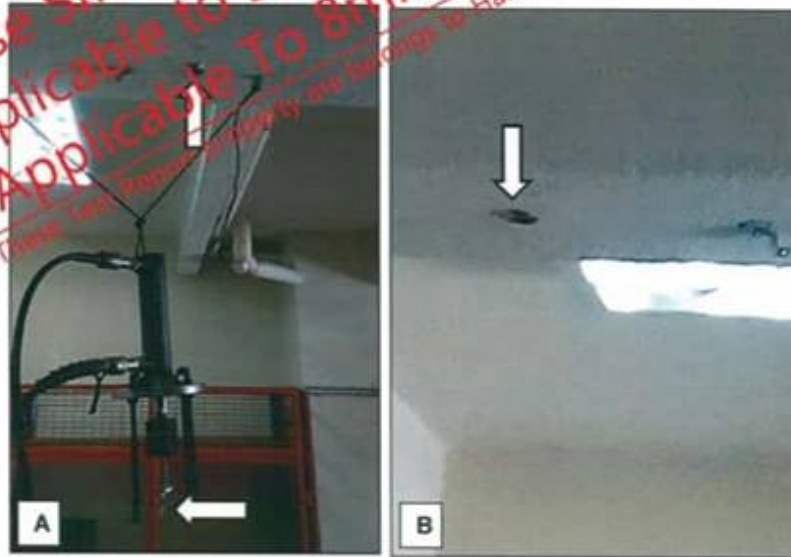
Fastener Shooting Nail after pull out for samples (A) and (B) at ceiling beam.
